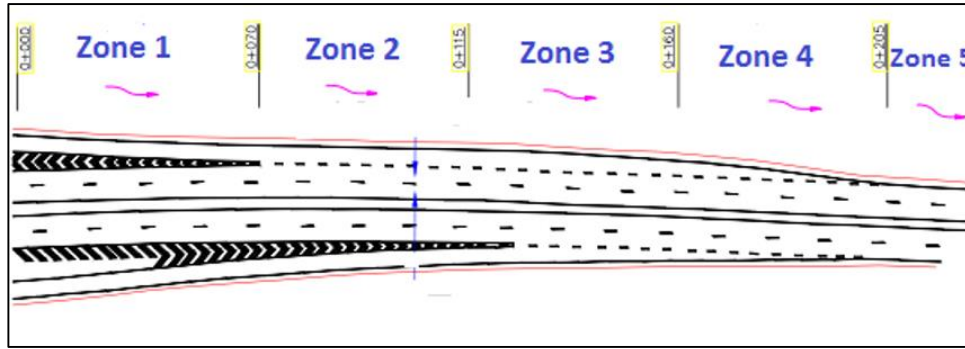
Zone Arrangement for Entrance Ramp Terminal
